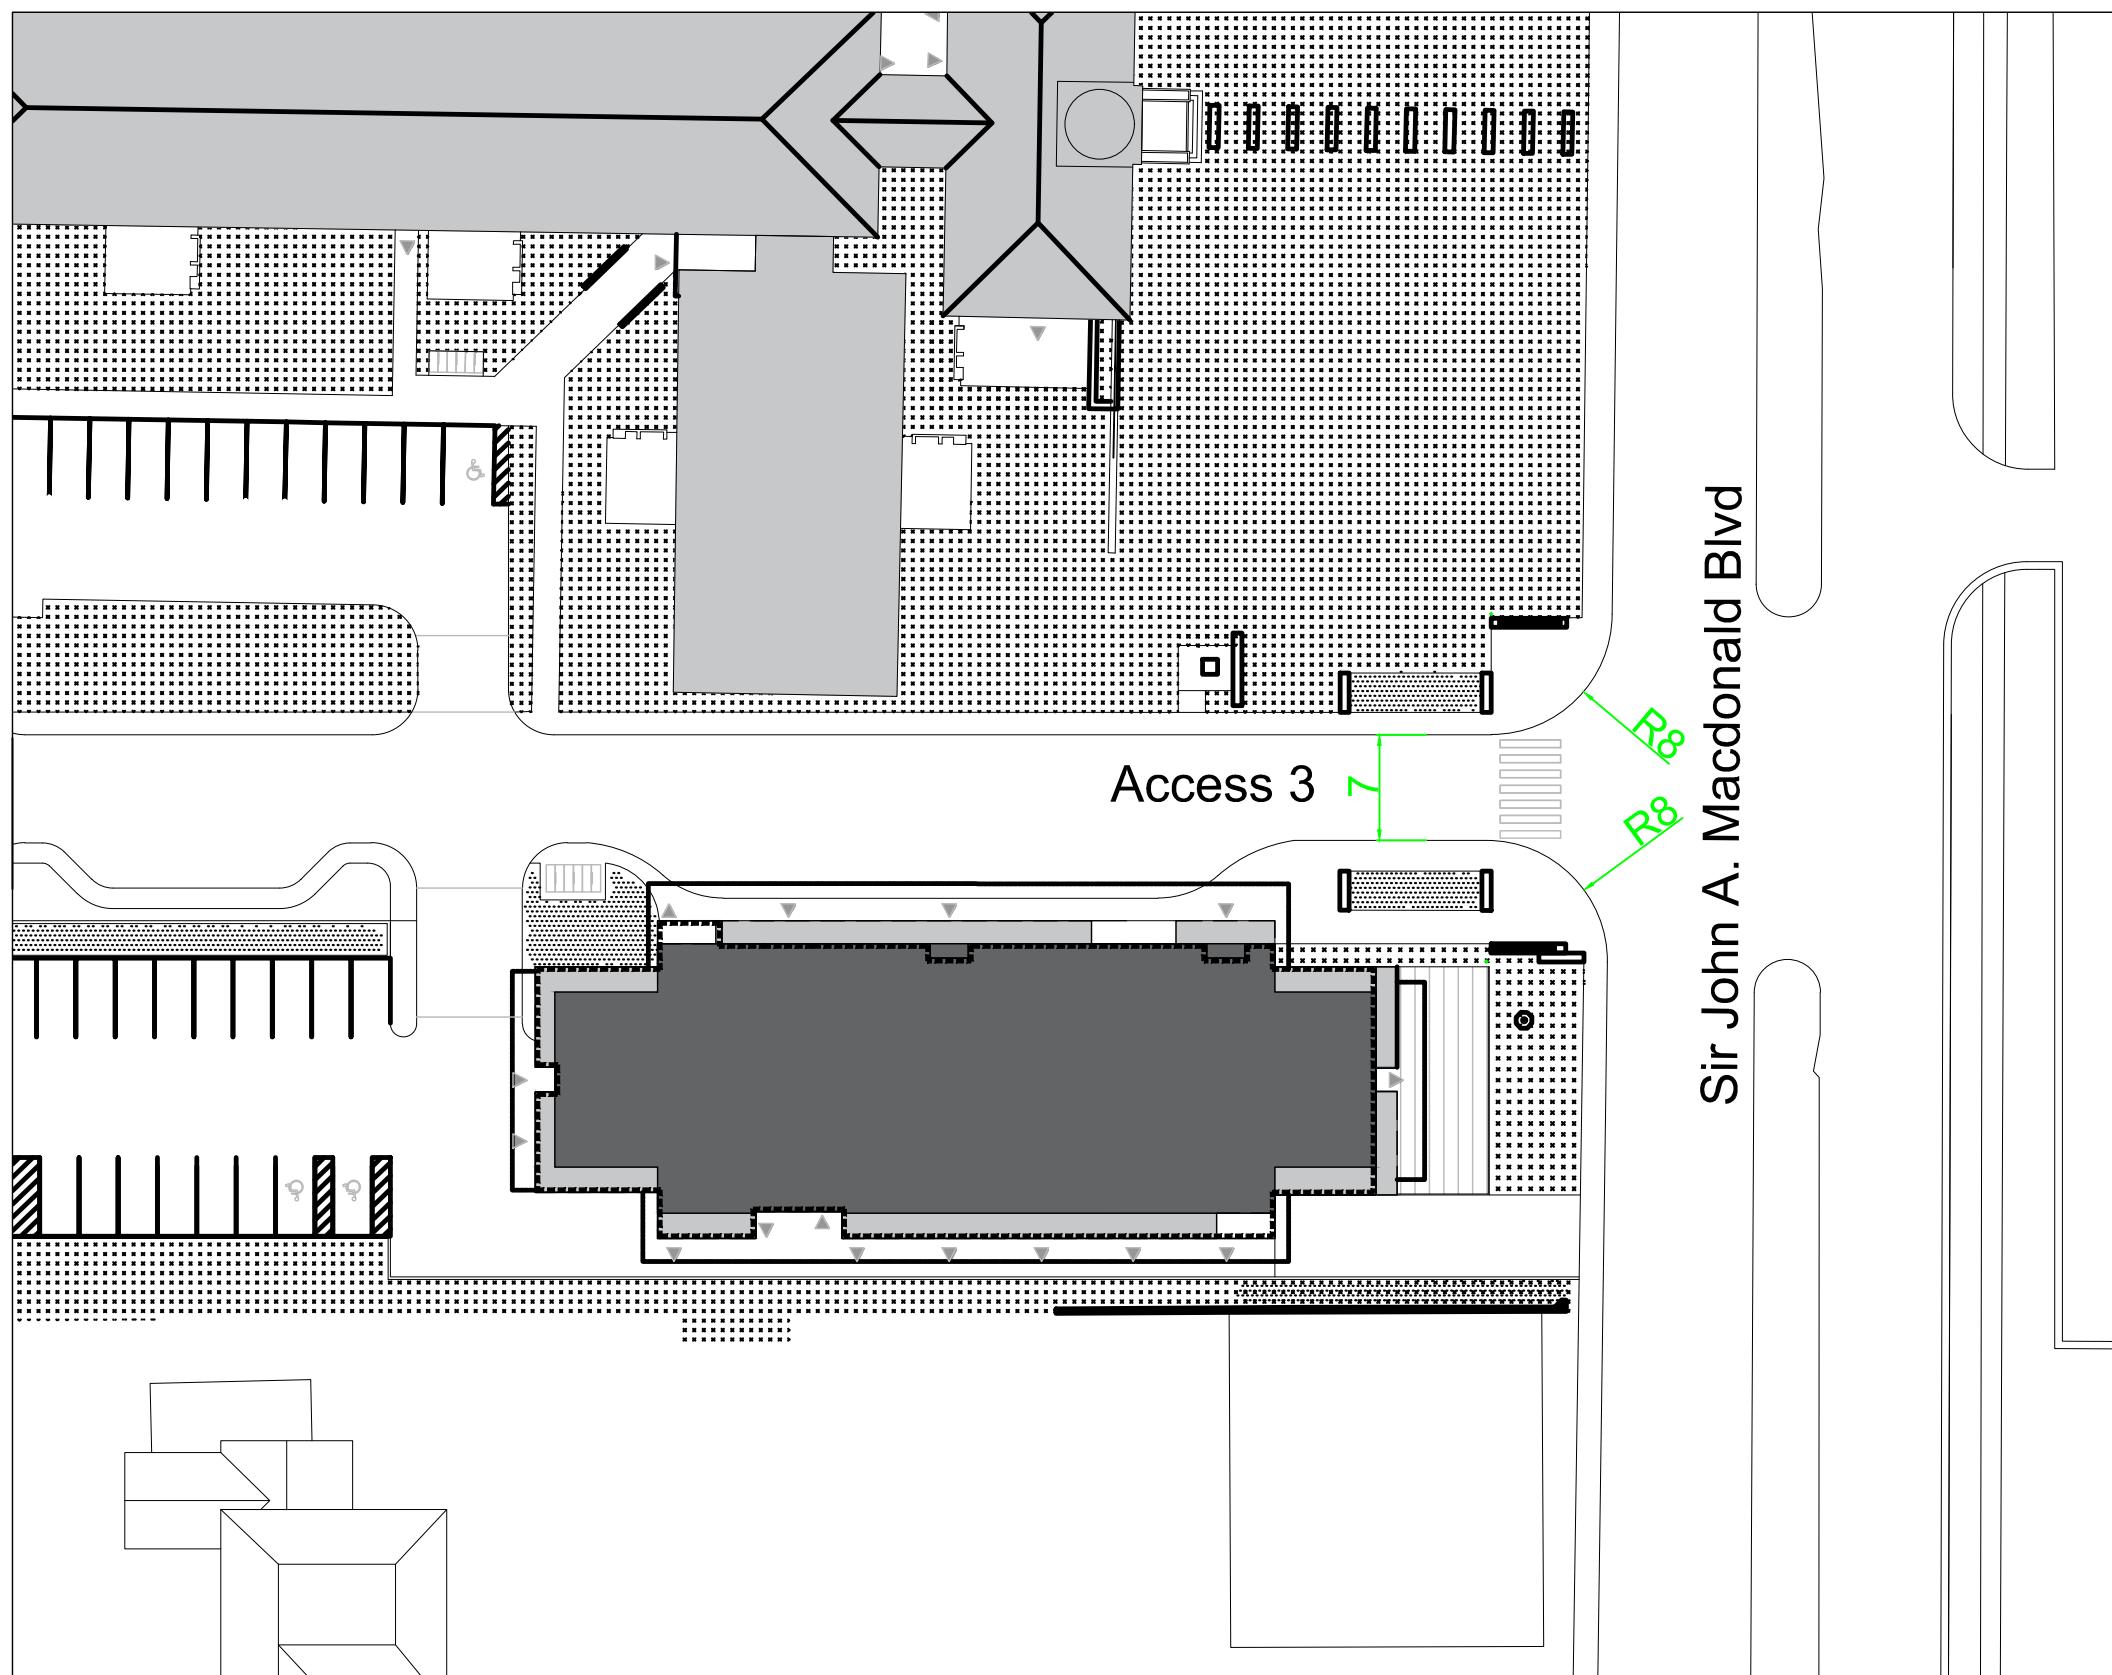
Site Access 3 Curb Radii and Driveway Width Review
